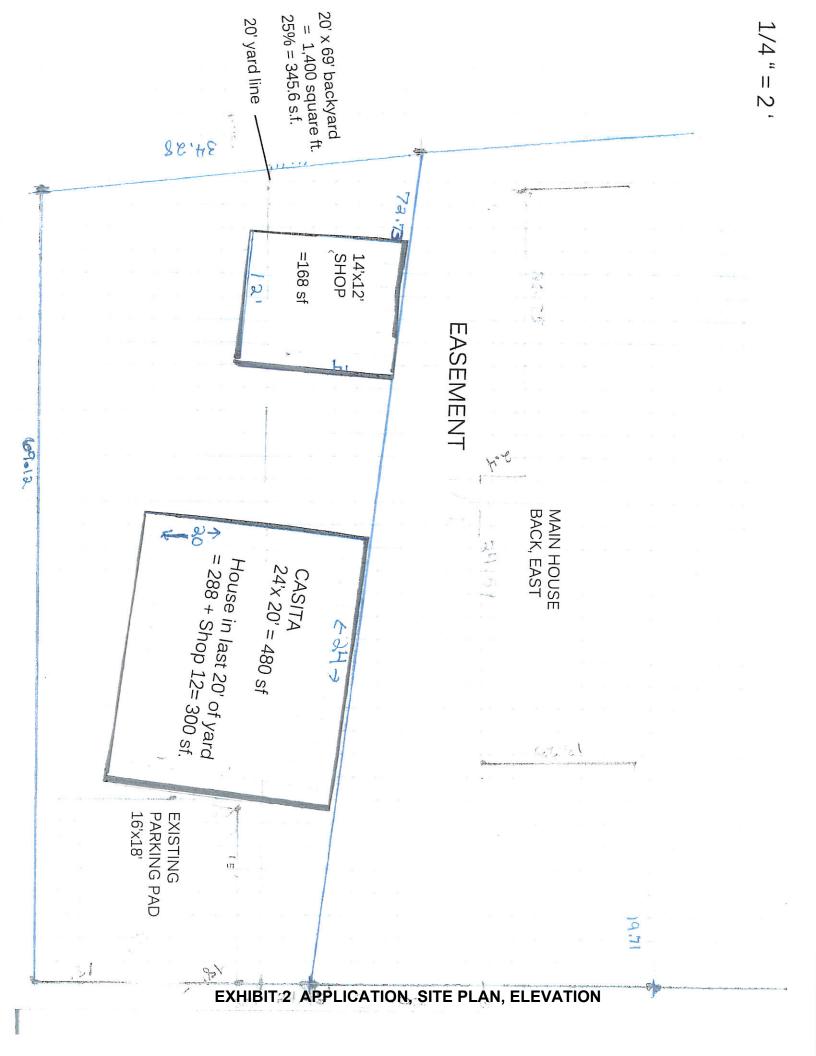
APPLICATION. SITE PLAN, ELEVATION
